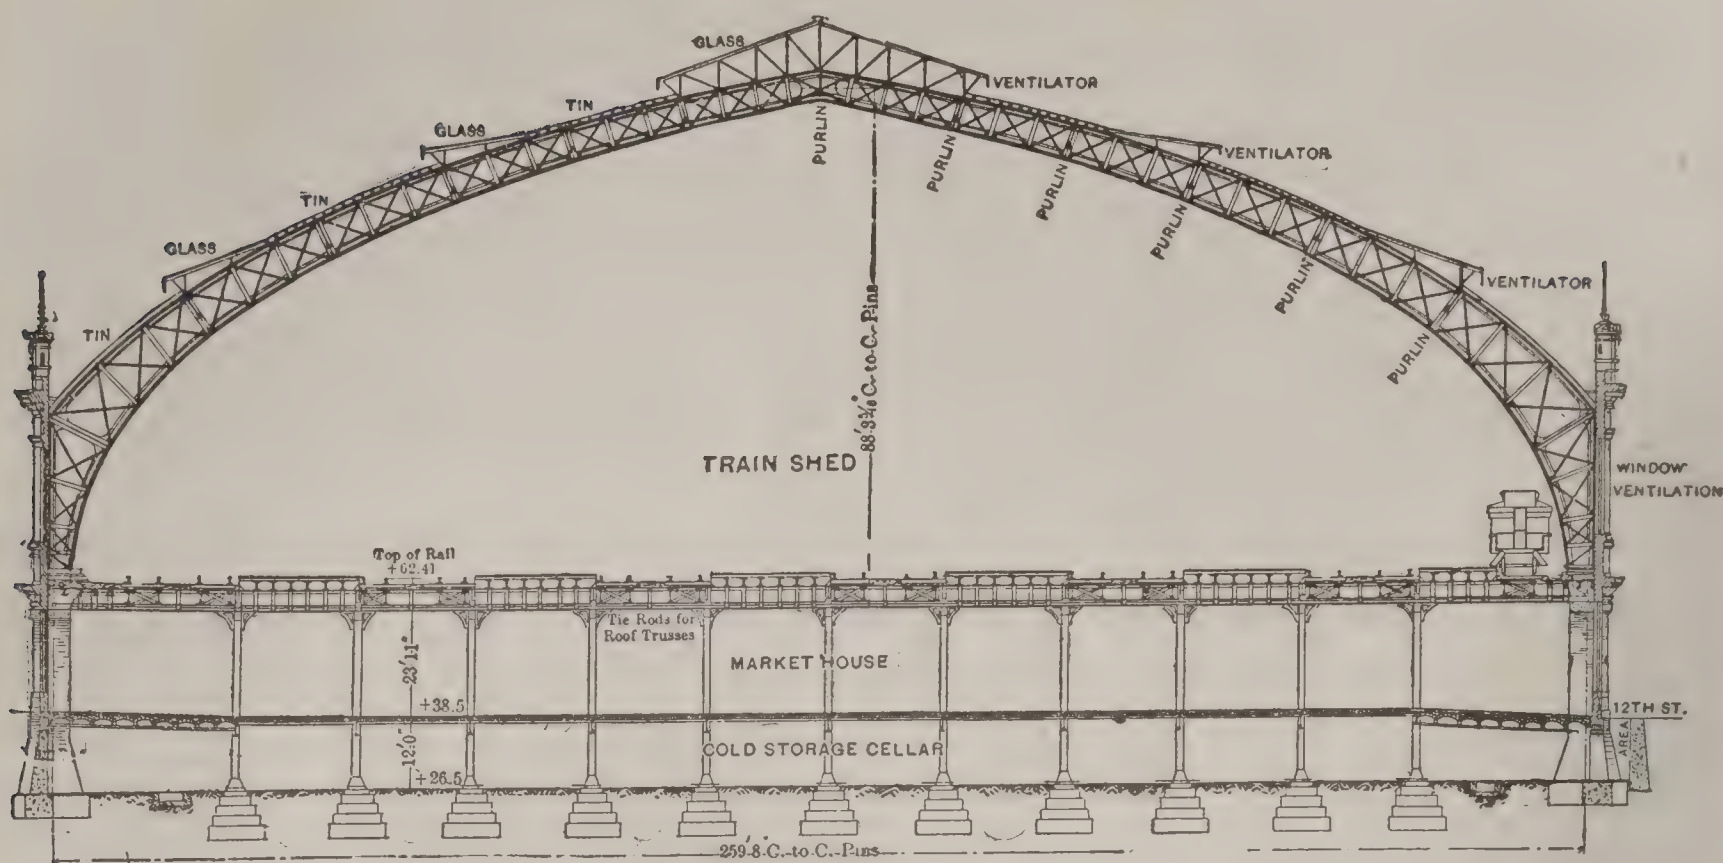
PLATE VII.— Cross Section of Train Shed Looking South, Reading Terminal, Philadelphia.
